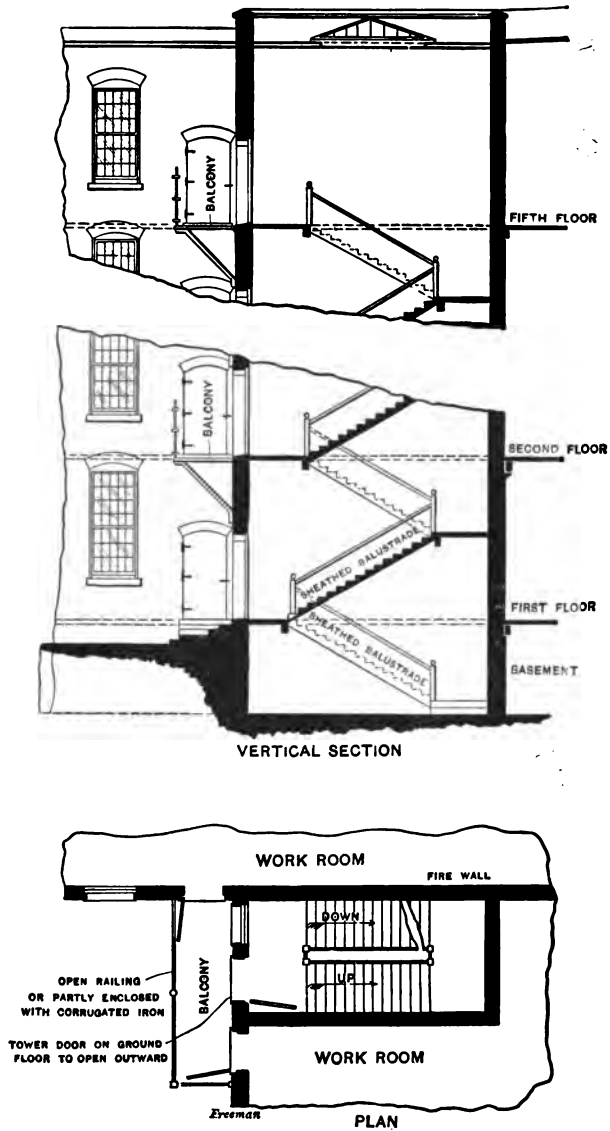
BALCONY STAIR TOWER AND FIRE ESCAPE FOR FACTORIES.
